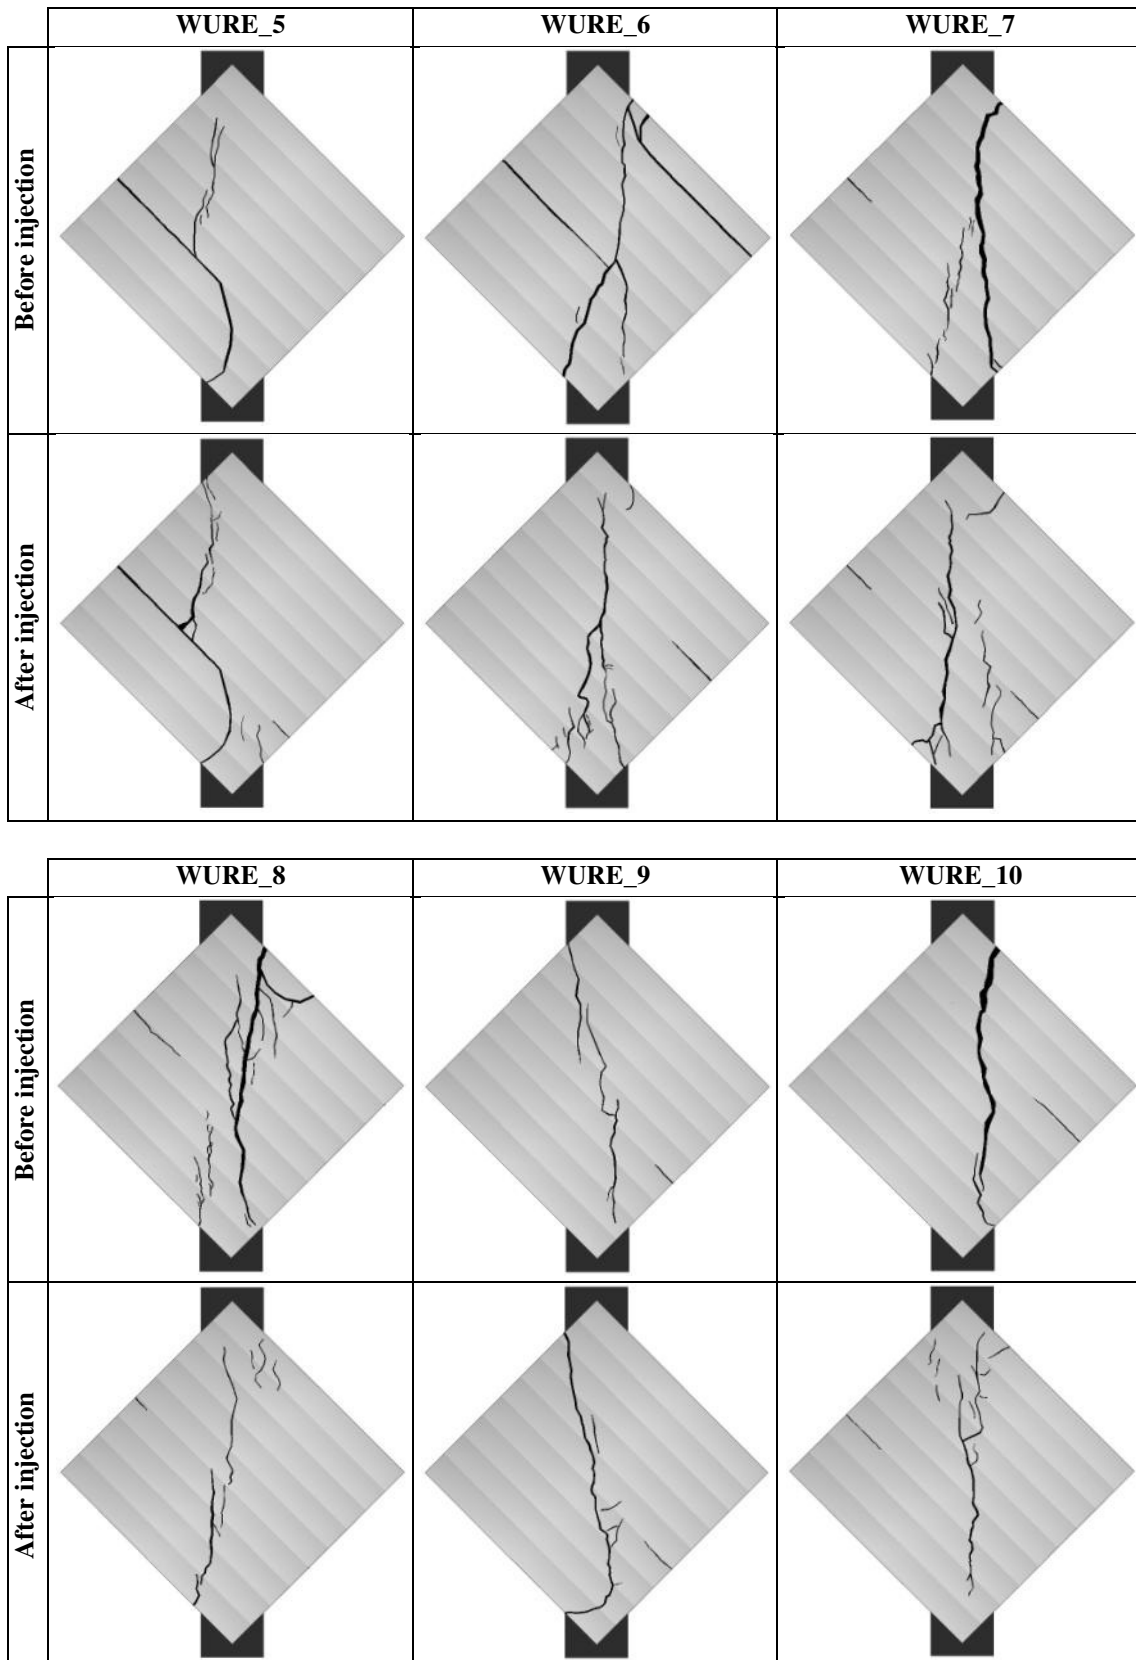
Failure crack patterns of the wallets repaired with grout II55NMG50-50, before and after injection.
